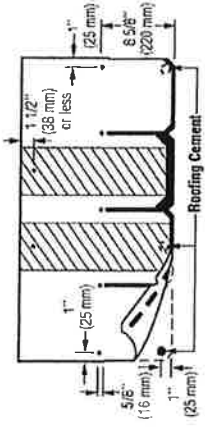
When installing Grand Manor Shangles on steep slopes, use seven nails and three spots of asphalt roofing cement.
